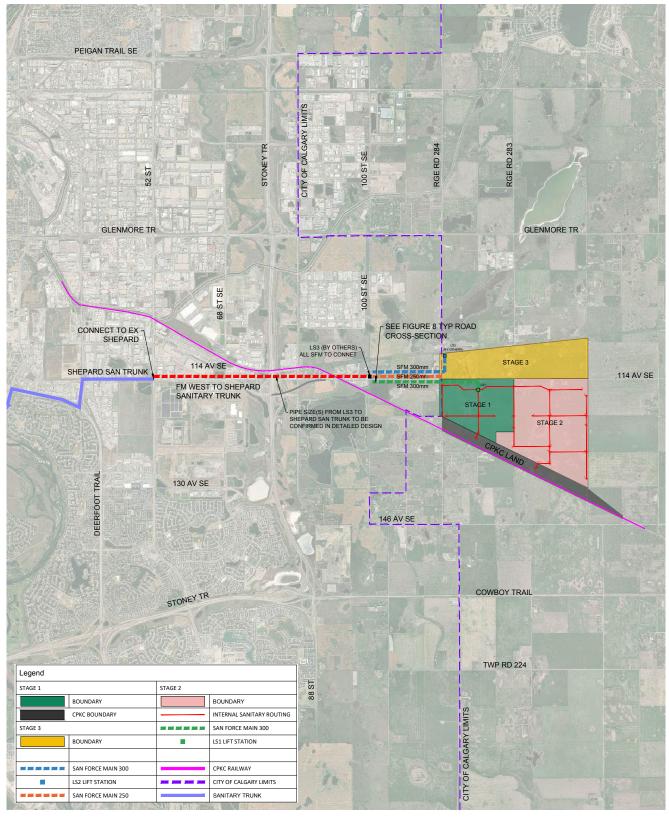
Sanitary Servicing Plan TOWNSHIP ROAD 232 RANGE ROAD 284 RANGE ROAD 283 Legend Subject Lands Proposed Sanitary Sewer Proposed Forcemain Proposed Lift Station
